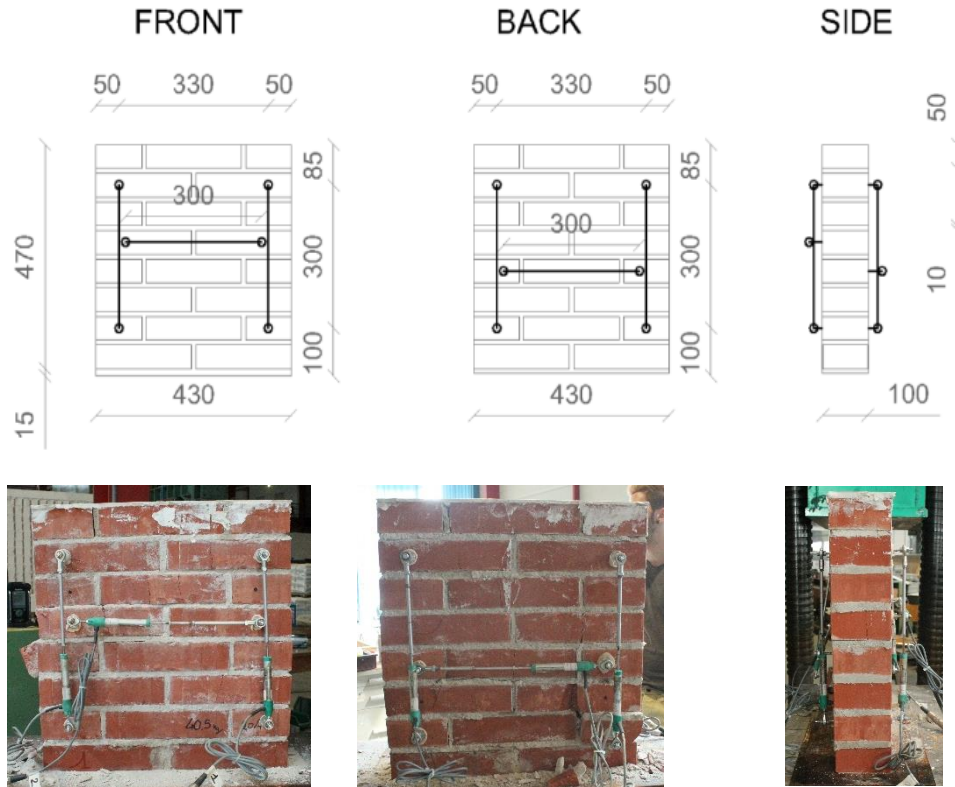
Geometry and instrumentation of test specimen, CL wallettes.
